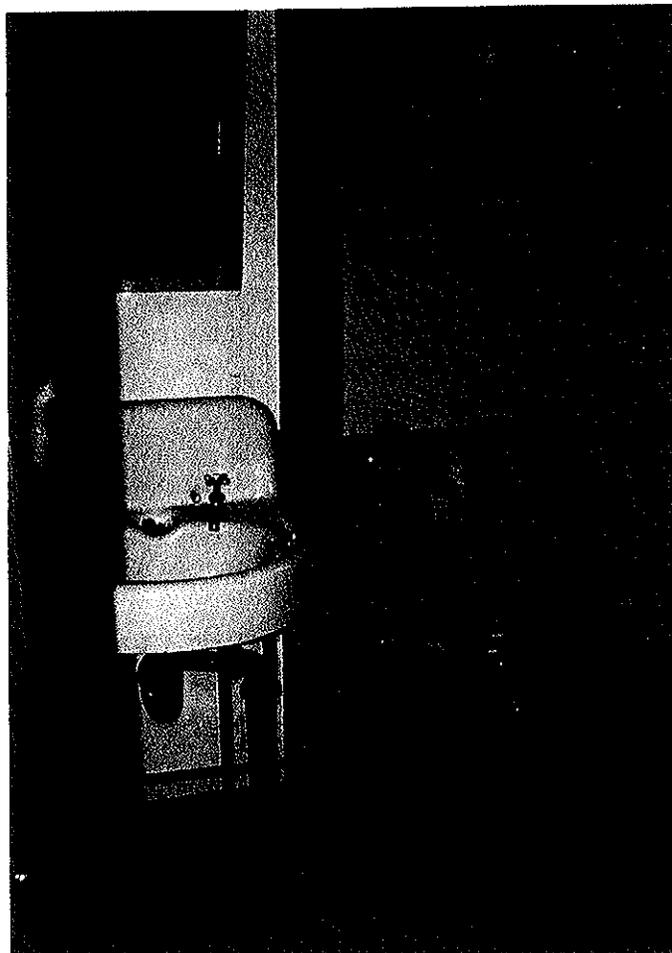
Weir House Basement - Half Bathroom [Room 008], Southwest Corner (1994).
